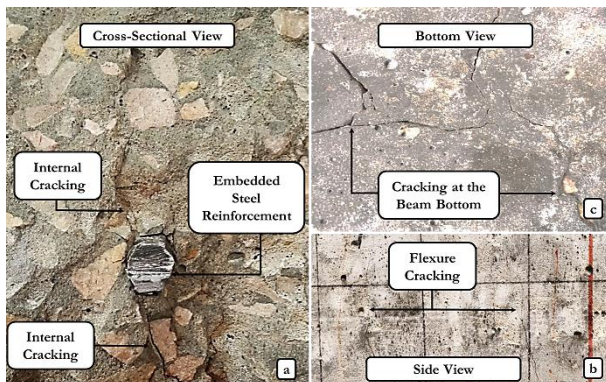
Experimental evidence of internal cracking in the concrete surrounding the steel reinforcement (a) Cross-sectional view (b) Side view (c) Bottom view
